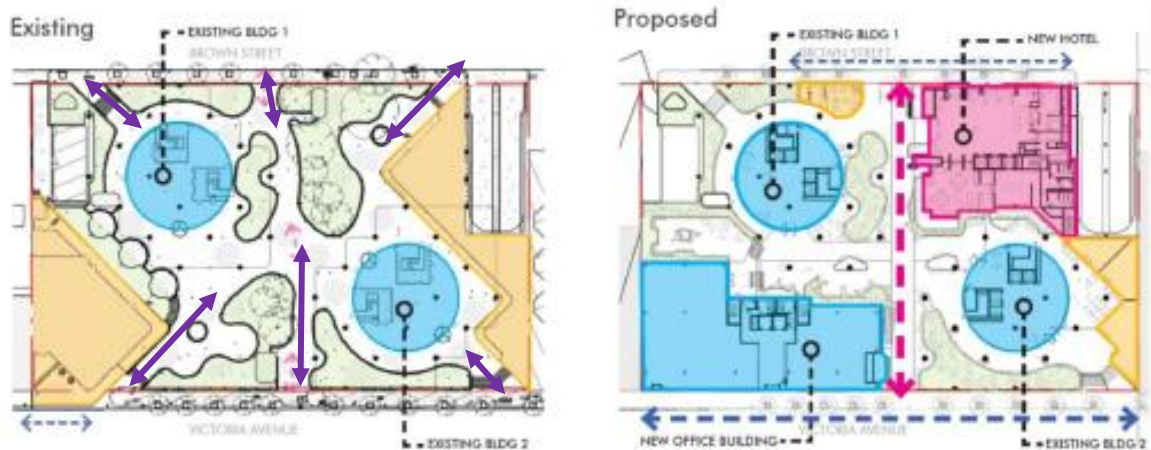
Existing and Proposed Ground Plane Study (Source: Nettleton Tribe)
